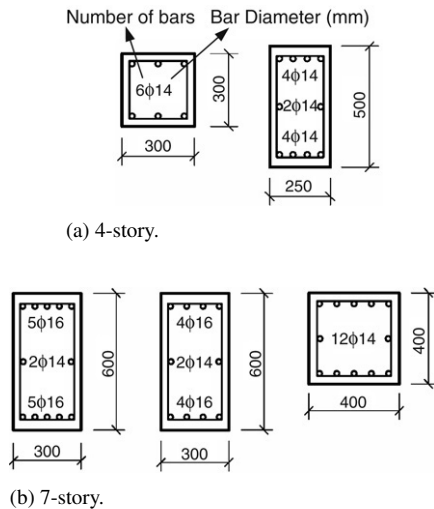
Typical column sections of 4- and 7-story building models (in mm).
